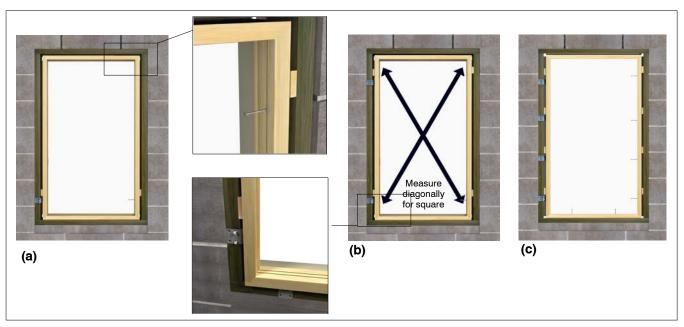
Plumb and square unit. (Illustration shows both structural bracket and jamb screw installation.)
